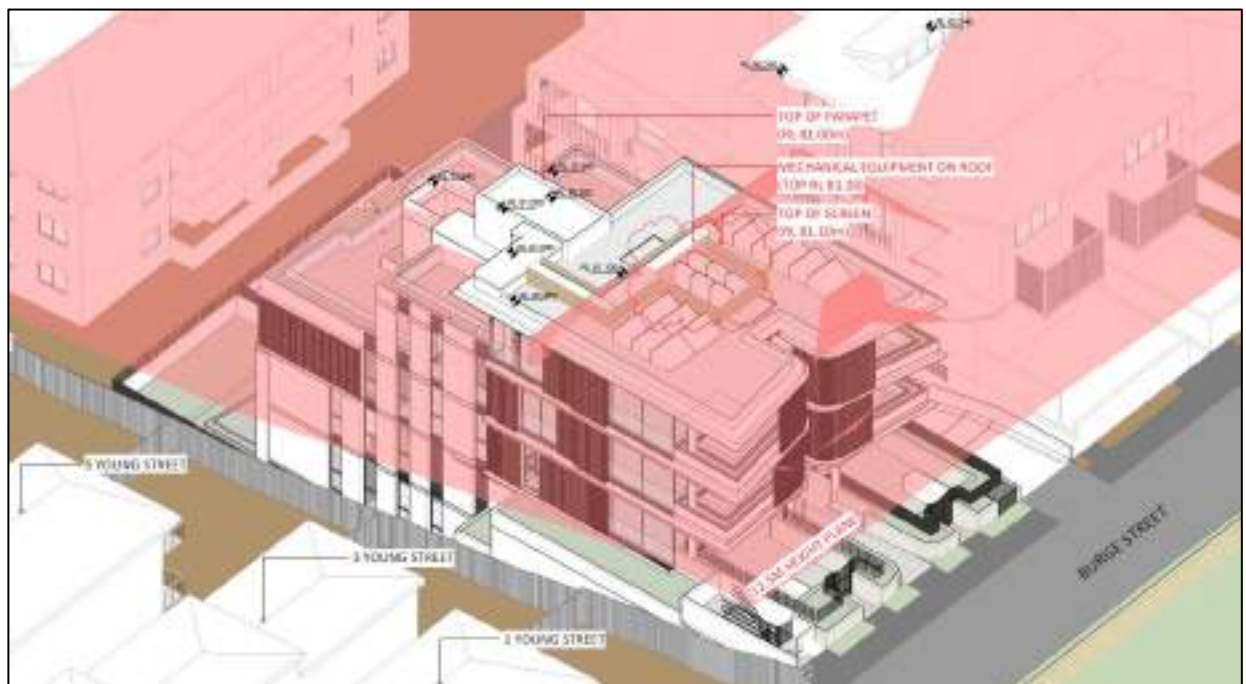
Height plane diagram submitted by the applicant with the amended proposal.
